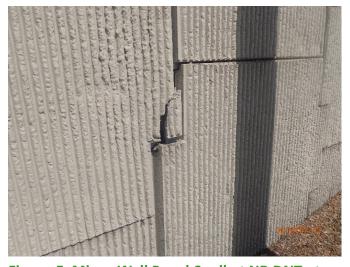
Minor Wall Panel Spall at NB DNT at Spring Valley.
